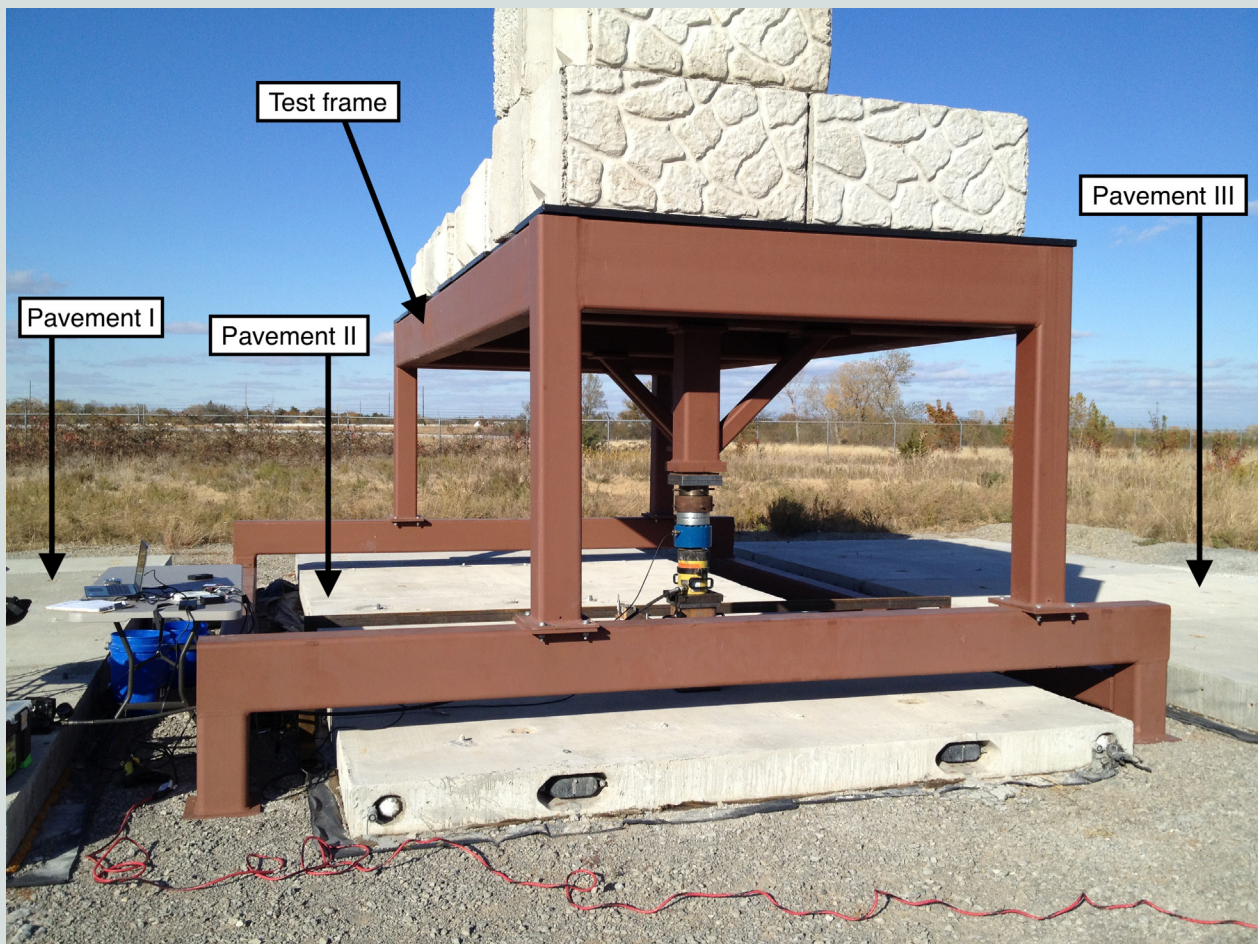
Completed pavement set-ups showing the test frame, post-tensioning anchors, and bond breaker between the pavement and base.
